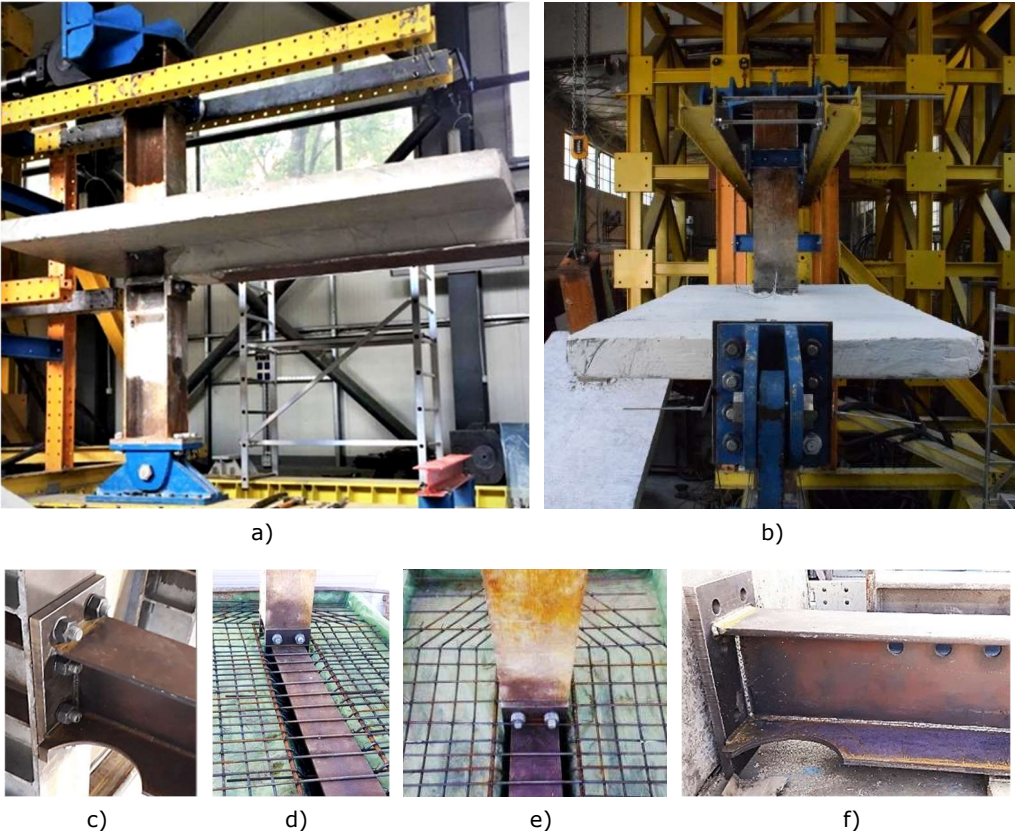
SF beam-to-column joint specimens: a) & b) joint on the experimental stand; c) bolted beam-to-column connection; d) & e) reinforcement layout; f) steel beam with *Reduced Flange Section* and web openings for concrete dowels
